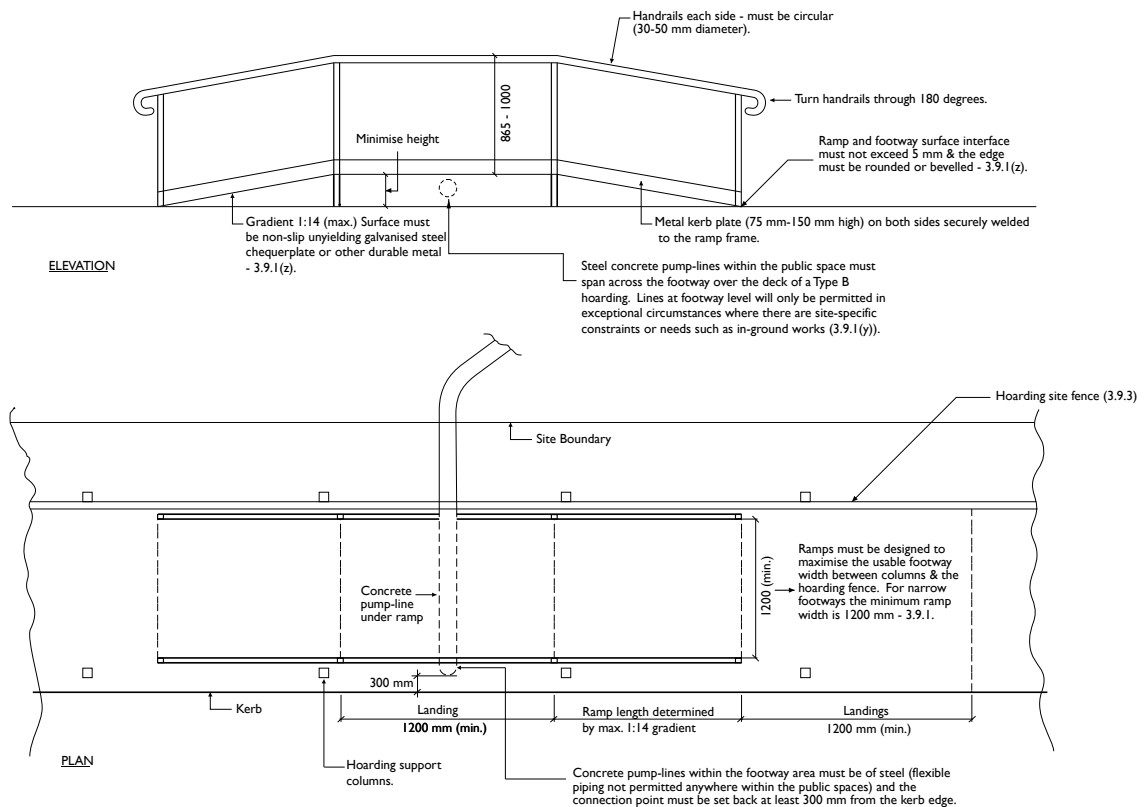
Design standards for pedestrian ramps over concrete pumping-lines. Note: Ramps are not permitted in cycleways and are only allowed for in-ground works and up to one level above ground level or to the height of a hoarding deck.
